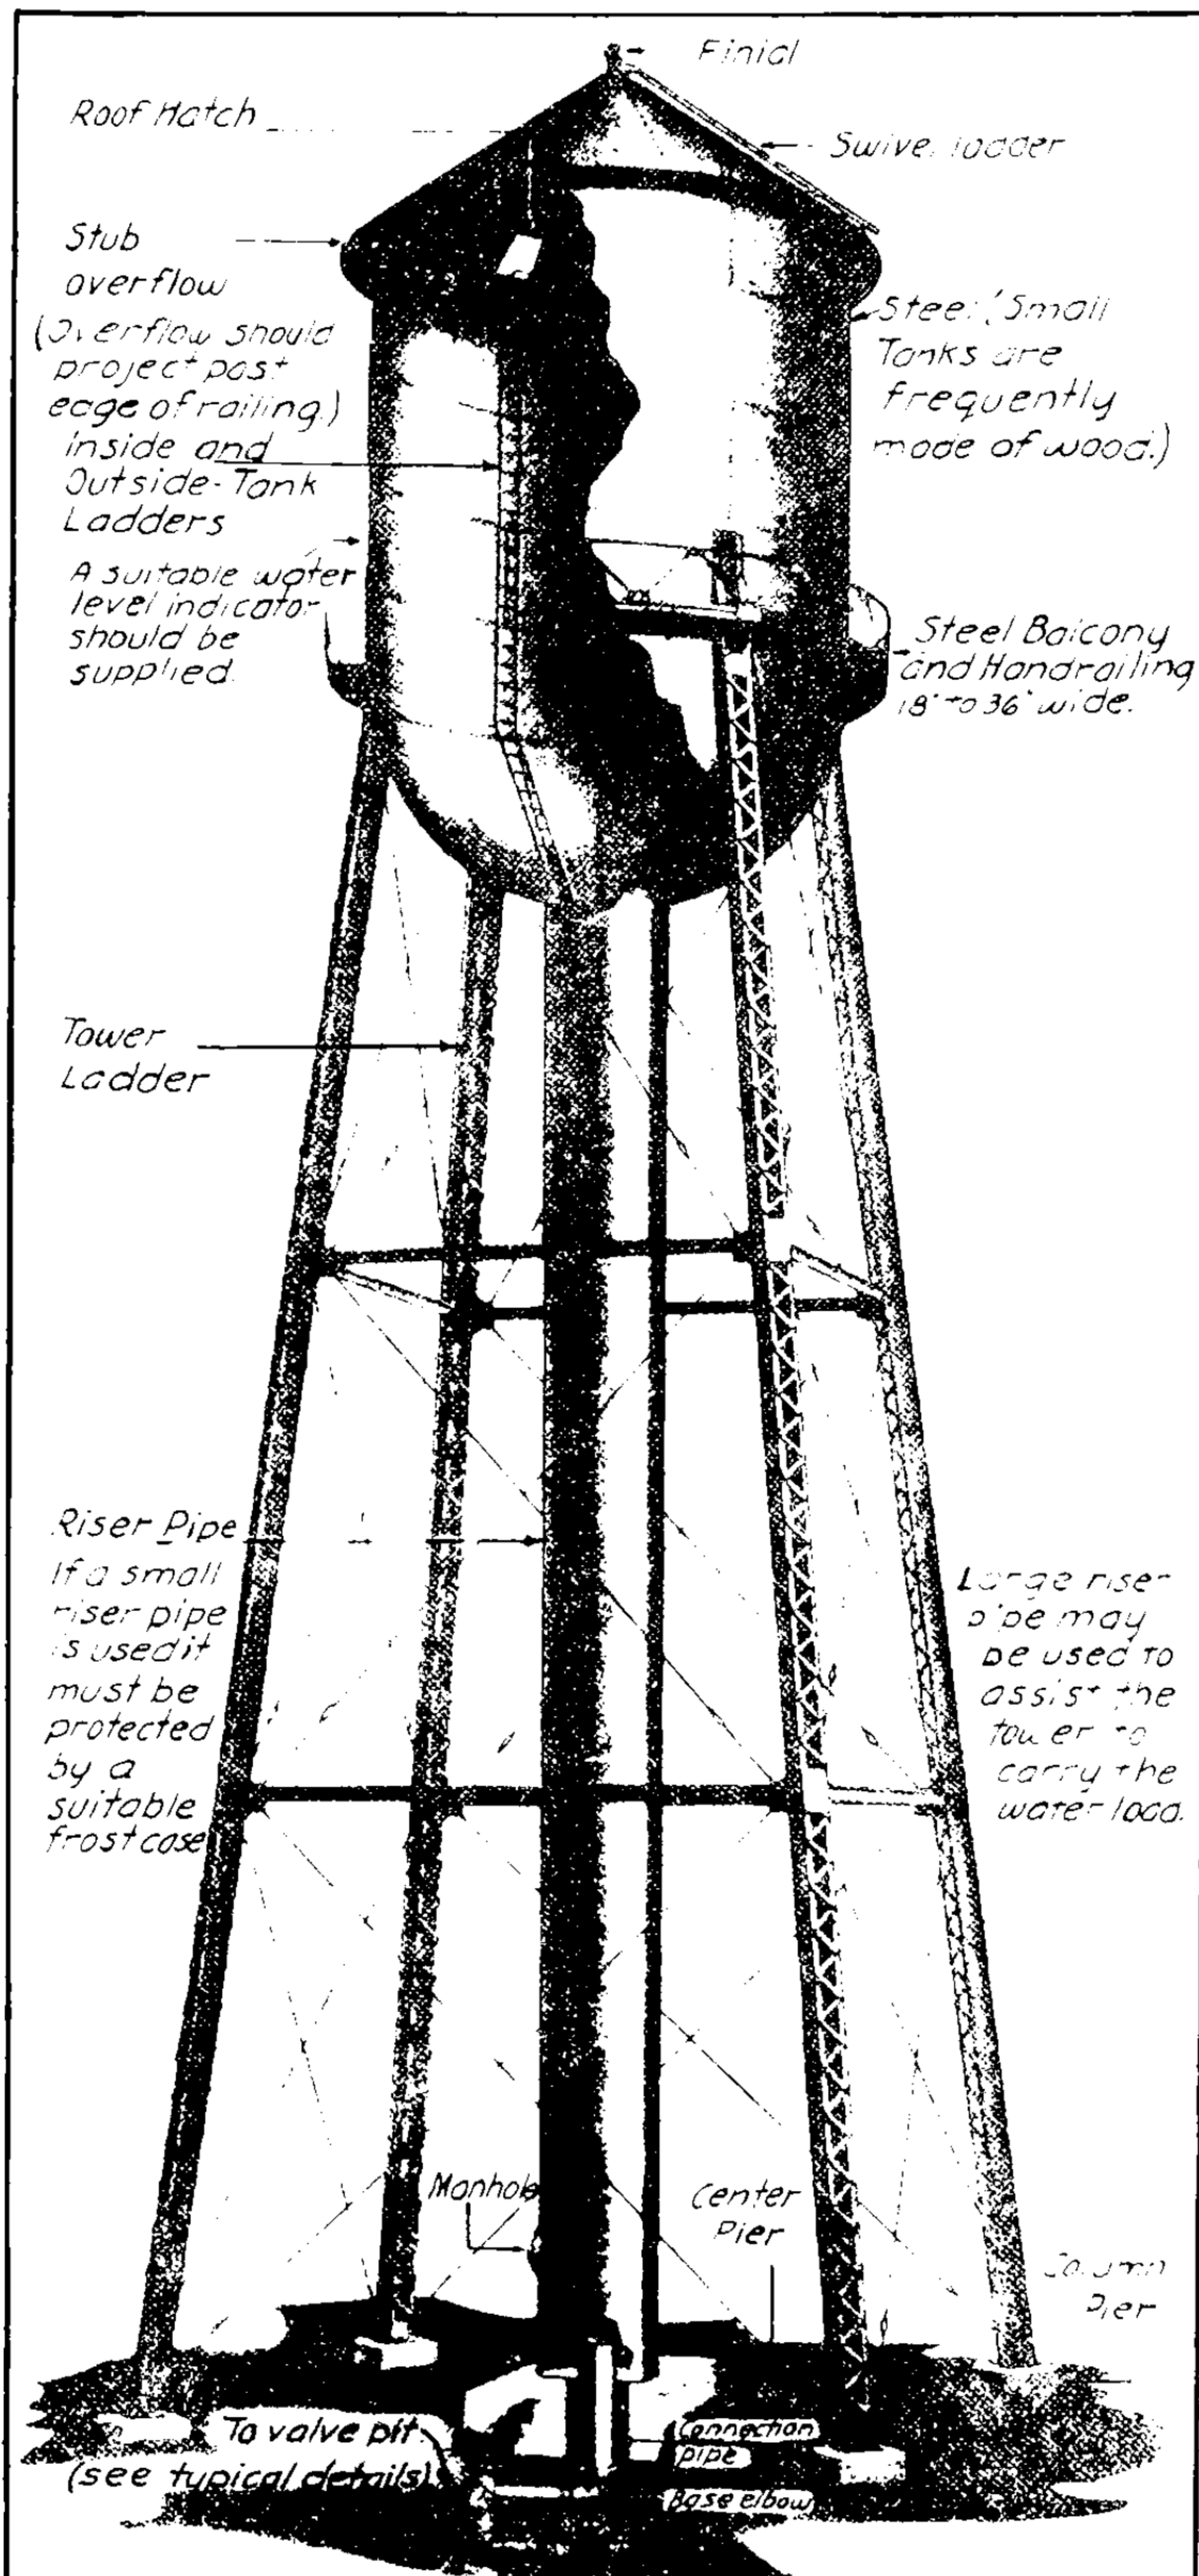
FIG. C- PARTS OF ELEVATED STORAGE TANK.
